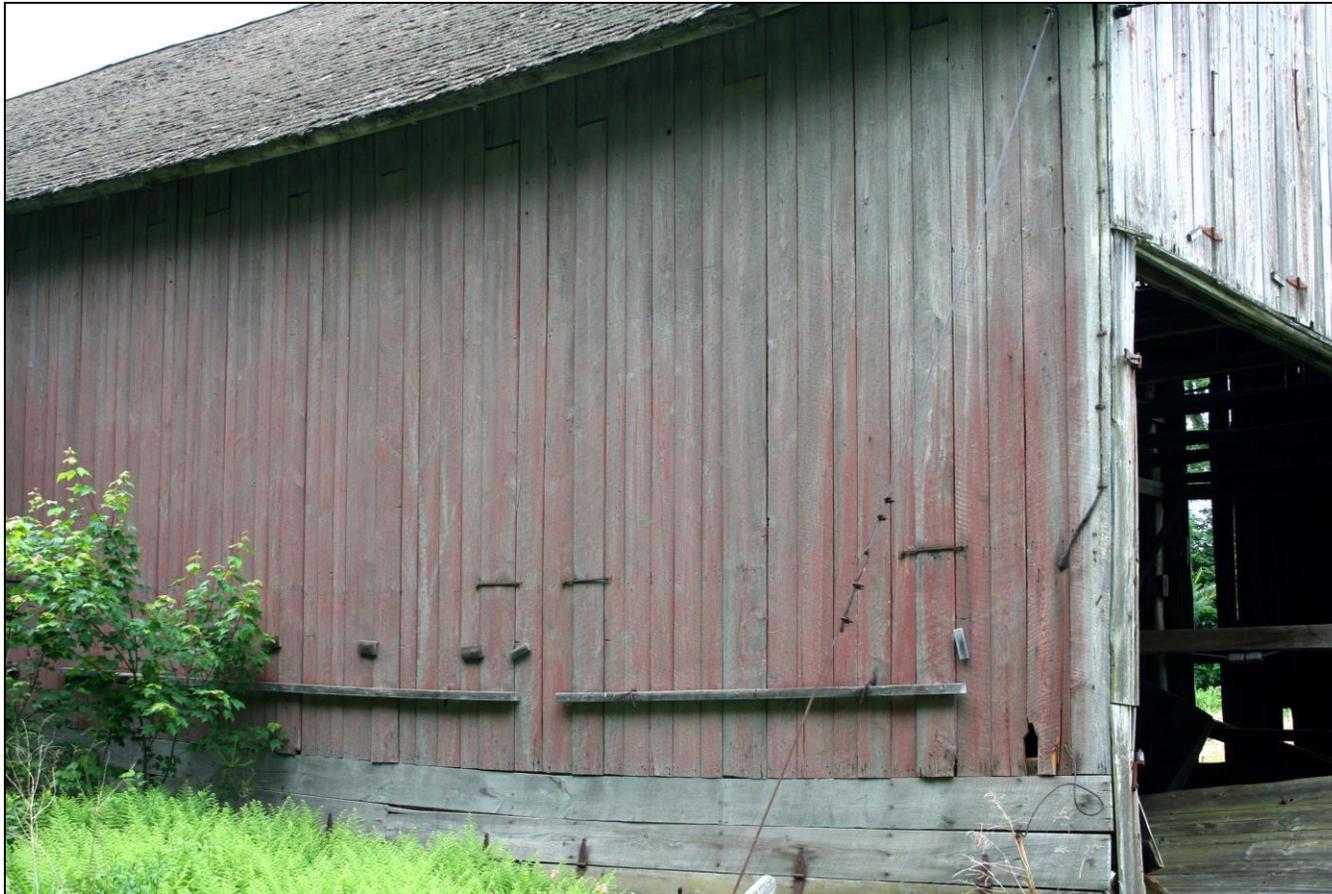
Barn A (2-18/18), east and north elevations, camera facing south.
